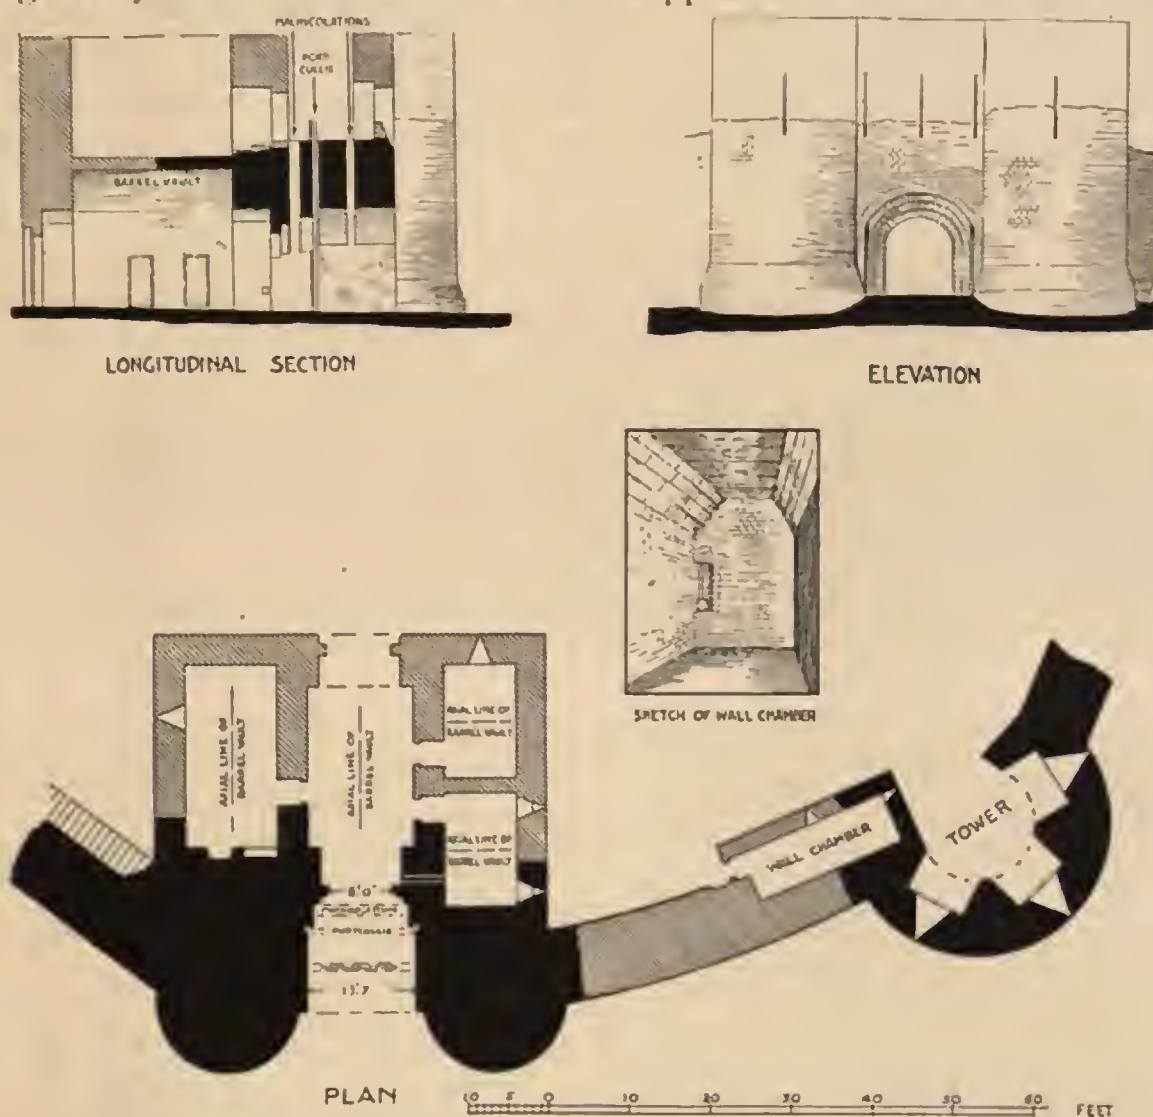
The Outer Gateway with the adjoining tower and wall chamber.
